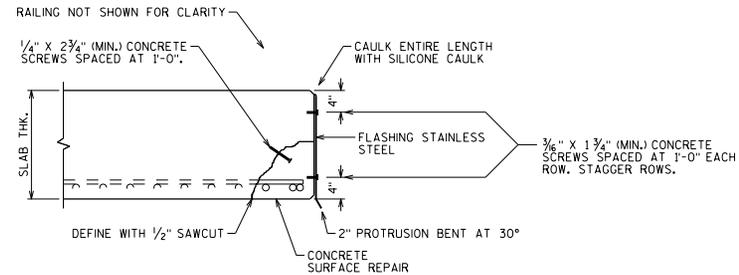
DETAIL FOR CONCRETE SLAB BRIDGE SIMILAR
